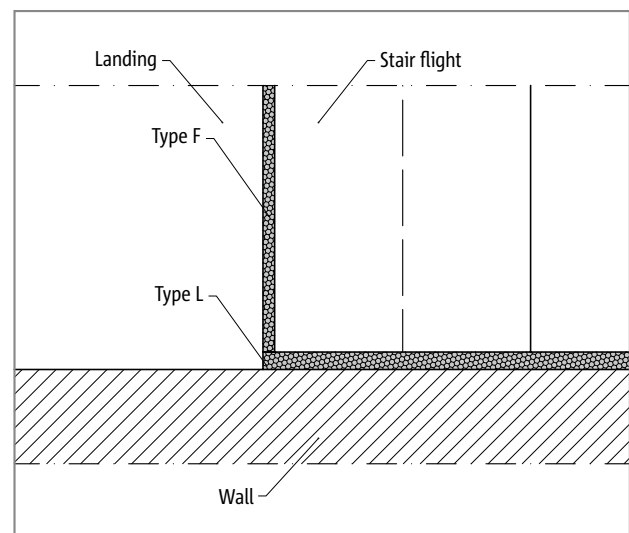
Schöck Tronsole® type F: Element configuration, Detail B
